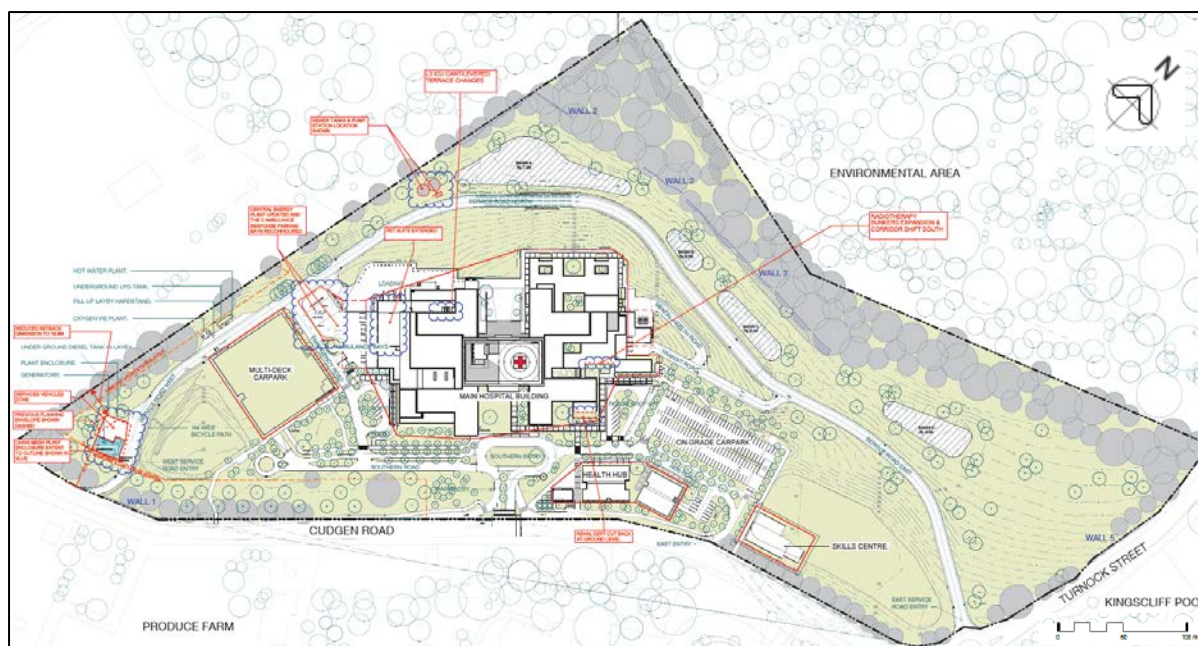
| Amended site plan (Source: SSD-10353-Mod-1 Modification Report, dated 17 March 2021)
